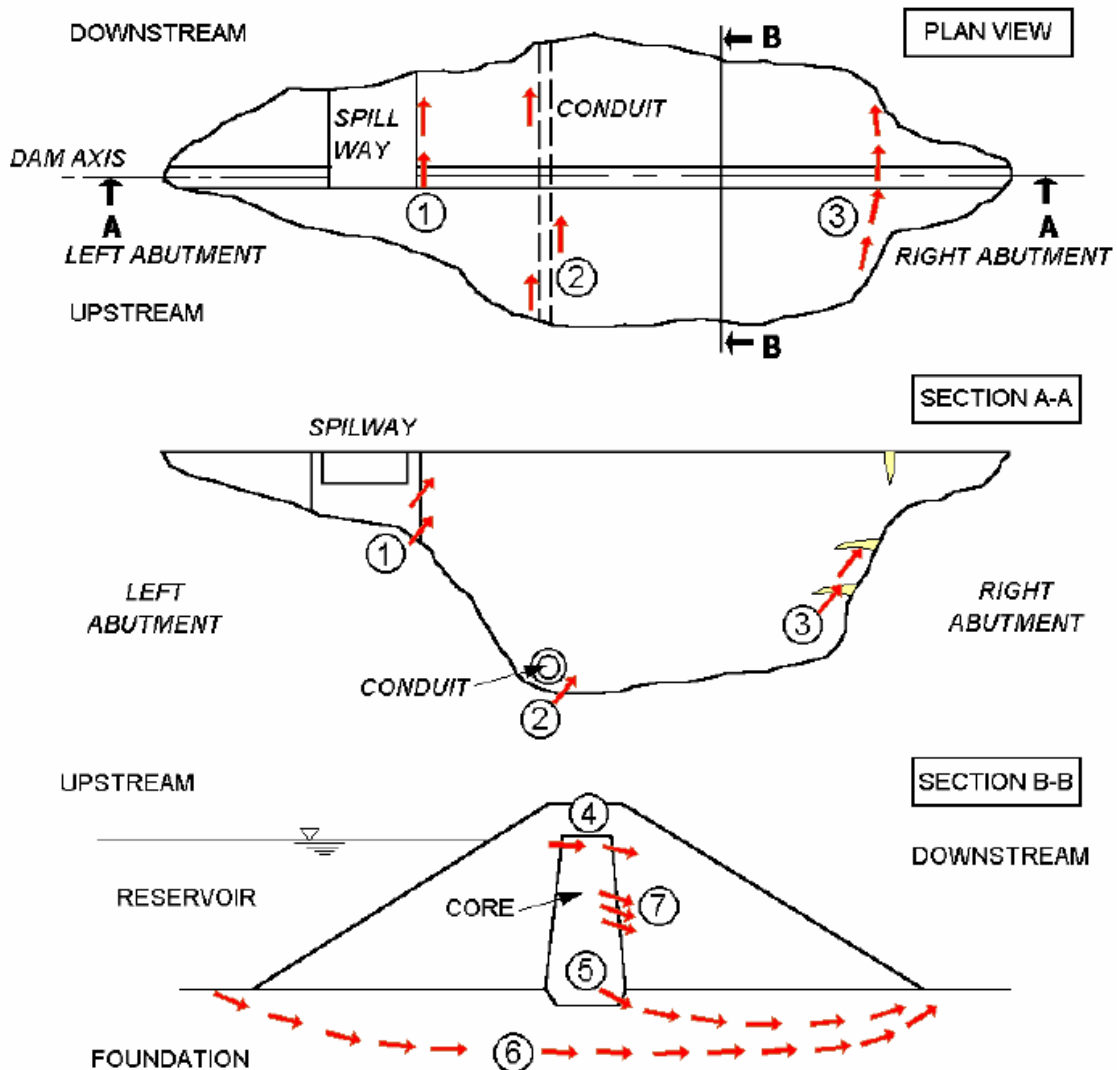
Possible locations of initiation of internal erosion (Fell and Fry, 2007); (1): spillway wall interface; (2): adjacent to conduit; (3): crack associated with steep abutment profile; (4): desiccation on top of the core; (5): embankment to foundation; (6): foundation (if the foundation is made of soil or is an erodible rock); (7): embankment through poorly compacted layer and or crack
